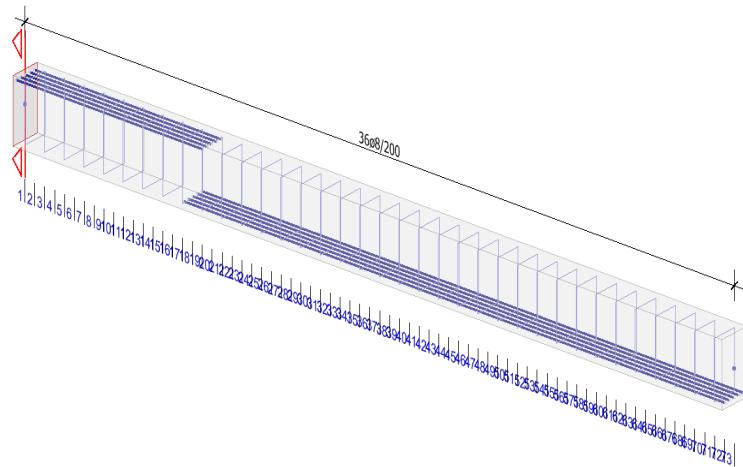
The cross section of the RC beam in FEM-Design
